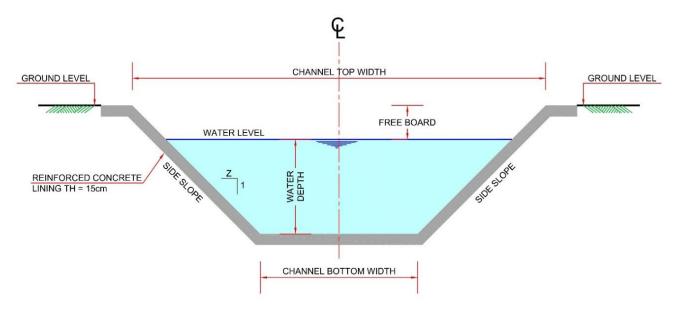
Typical Cross-Section for a Concrete Lined Channel (Bed and Sides)
